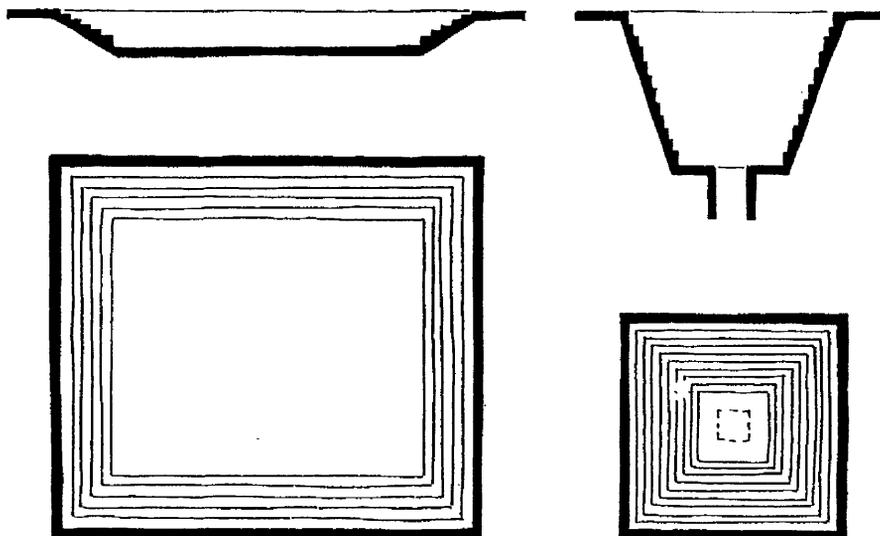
Section and plan of a tank (a) and a *kunḍa* (b).
